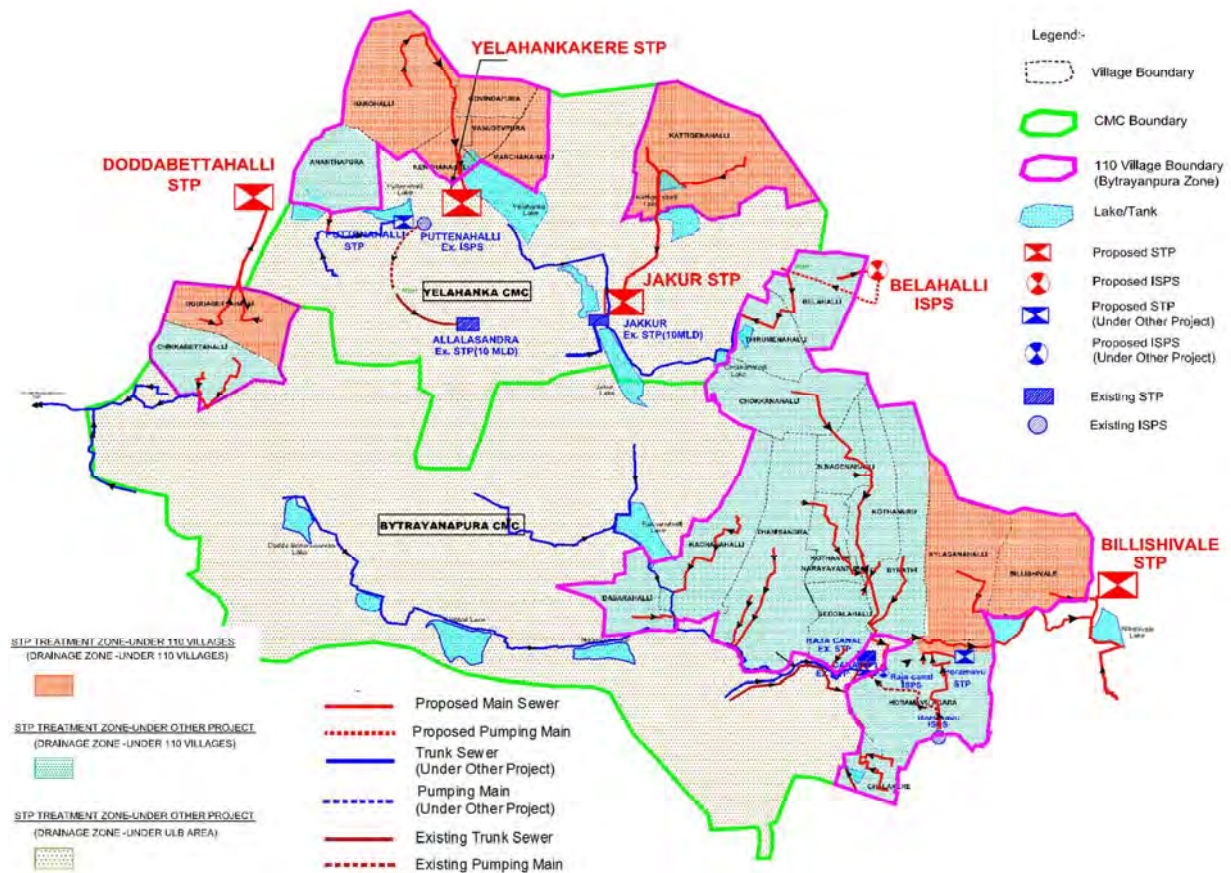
Layout Plan of Main Sewer Lines for All Zones
